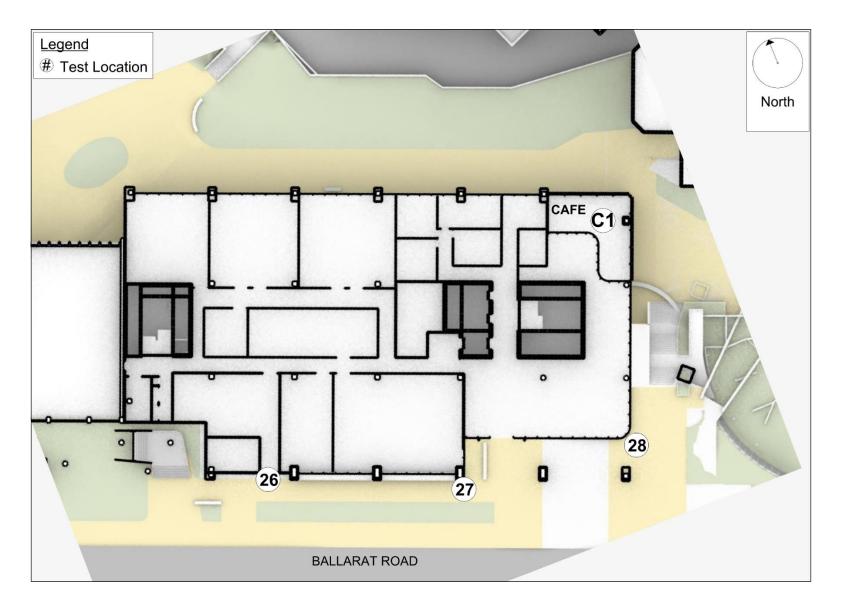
Test Locations along the Ballarat Road Frontage and café area of the proposed VU CHTF Development.
